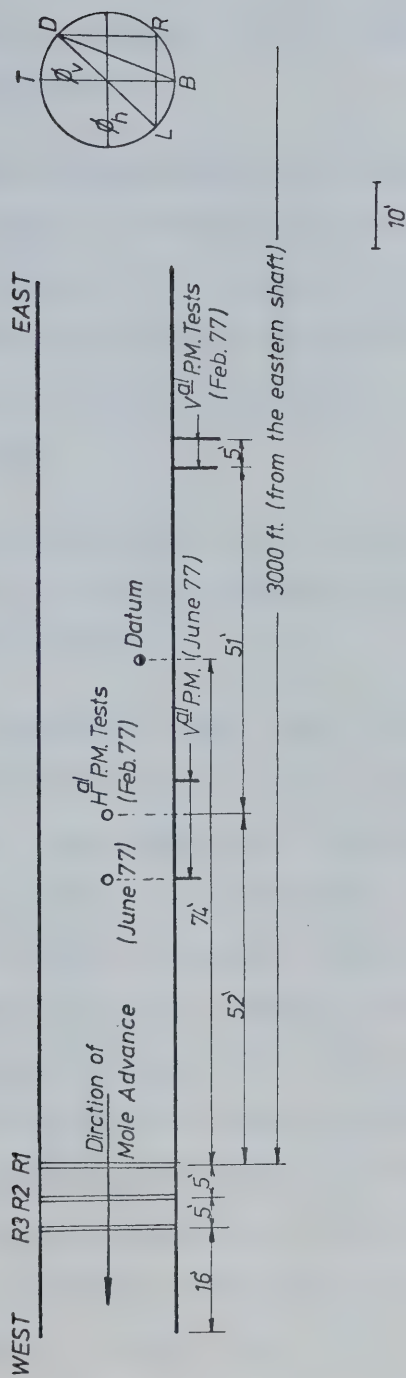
Details of the Test Section in the Whitemud-Creek Tunnel.
